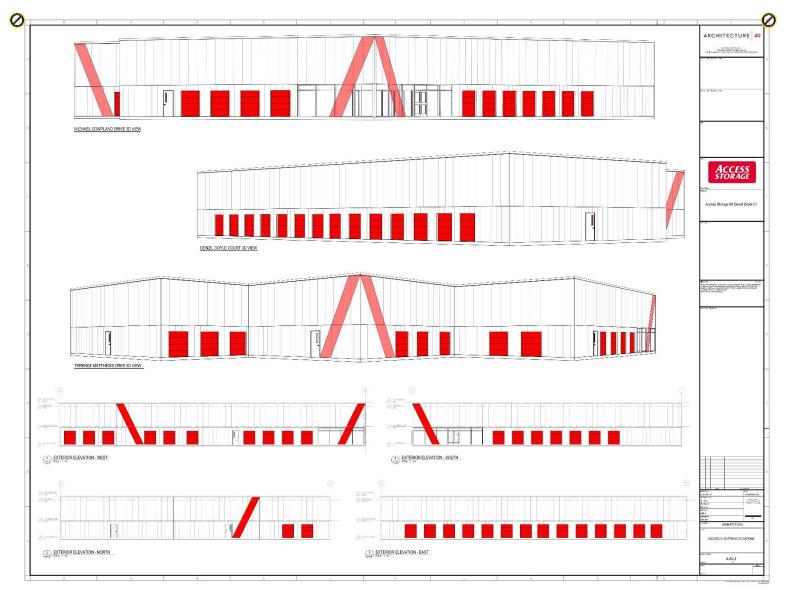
Proposed Building Elevations and 3D Views - Building A (Architecture 49, dated December 7, 2022)
